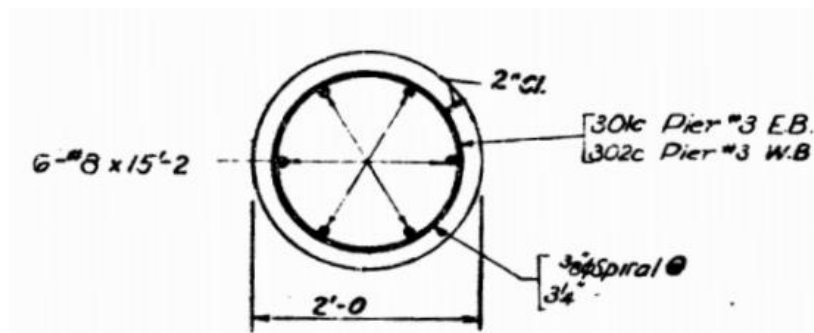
Cross-Section of Pier 3 Column for Structure I64-07-02367 BEBL (NBI 33280) (INDOT, 1964)
